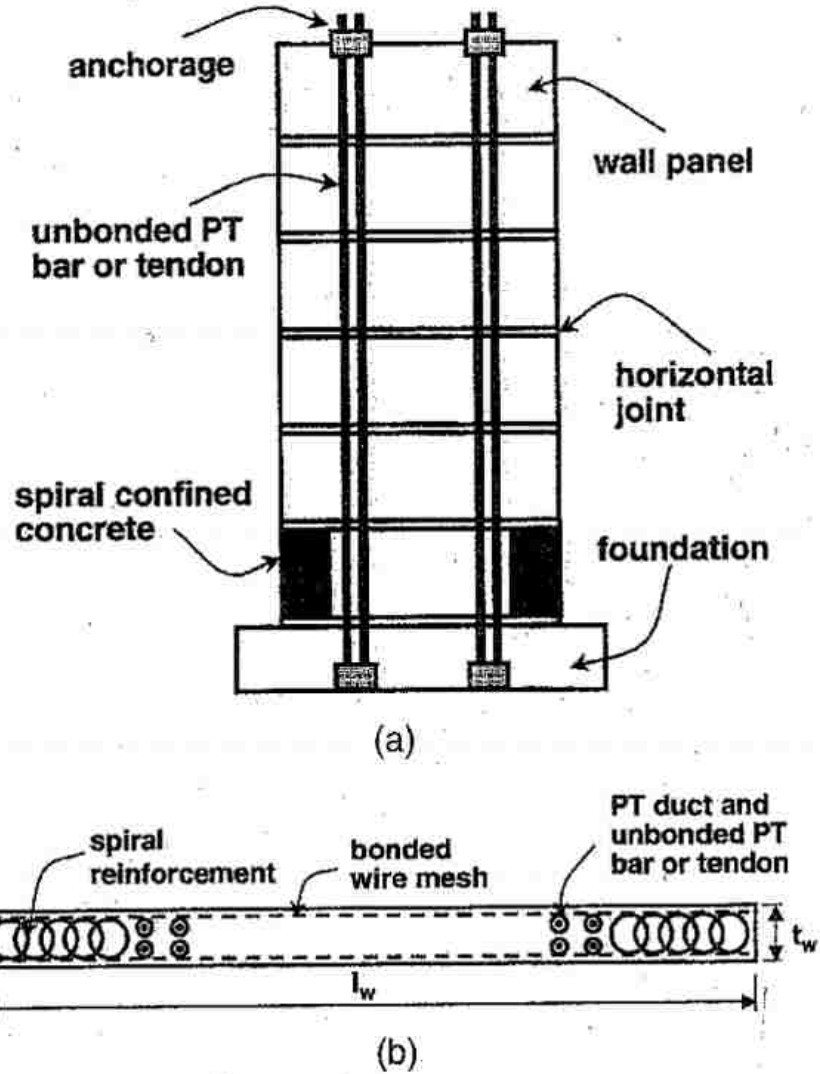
Unbonded post-tensioned precast wall: (a) elevation; and (b) cross section near base (enlarged), from [43]
